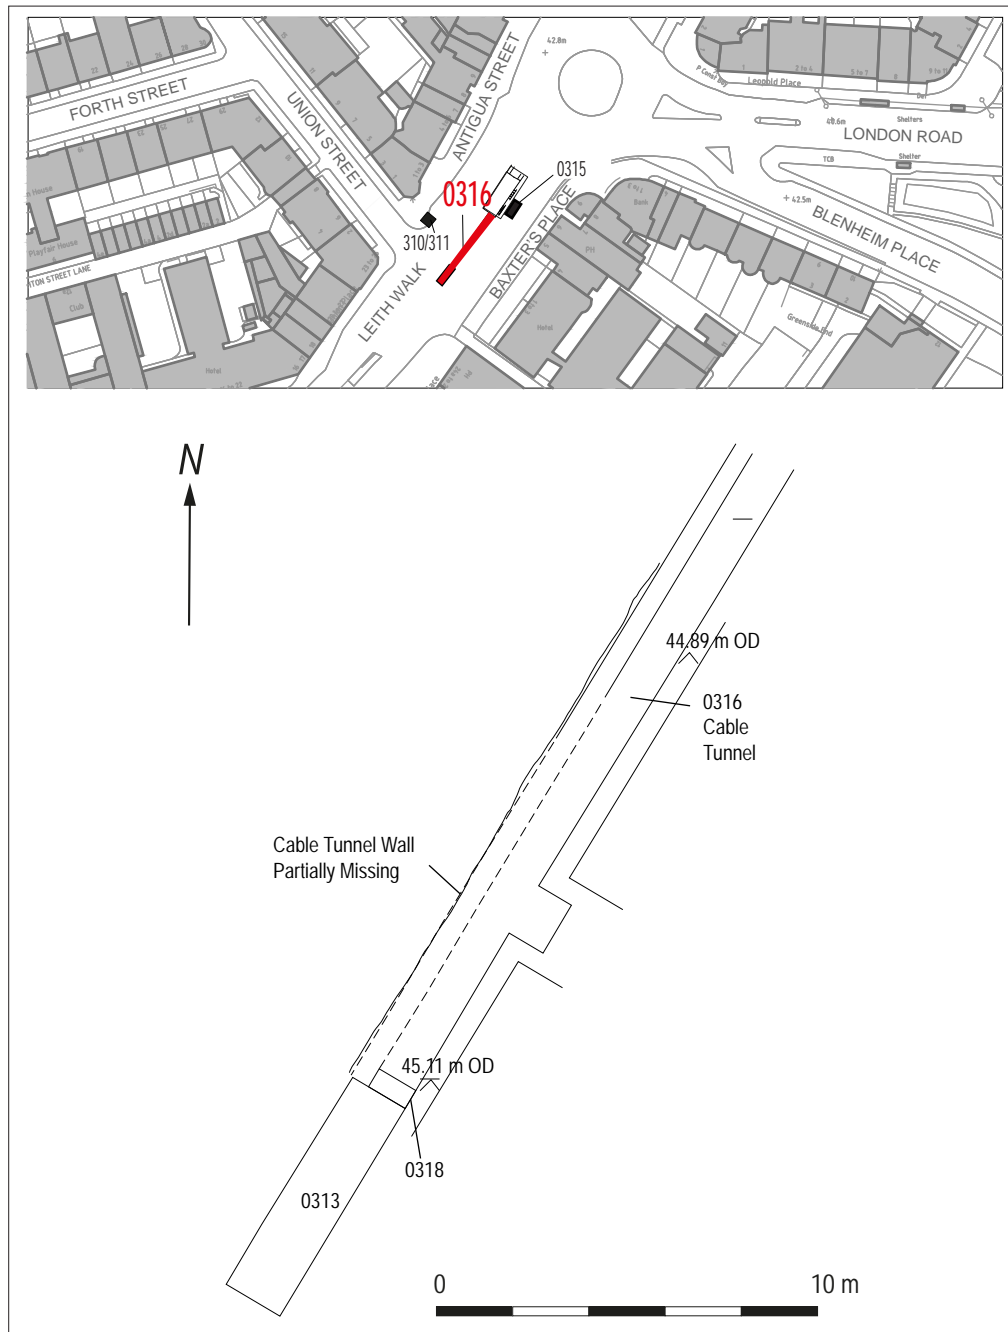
Plan of Tram chamber 0313 and the cable tunnel
